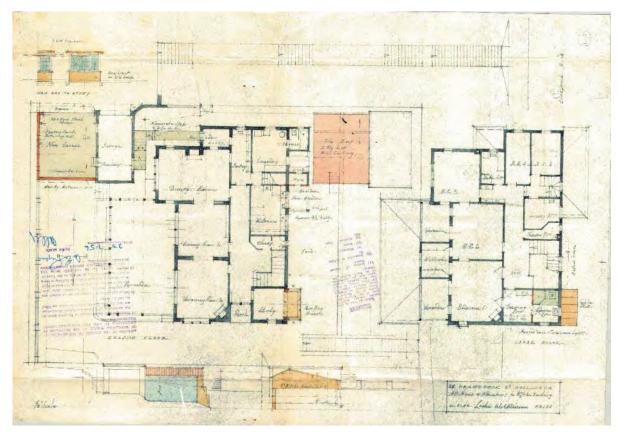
Plans from BA167/1956 for Dr J Dowling (Source: Woollahra Records)
